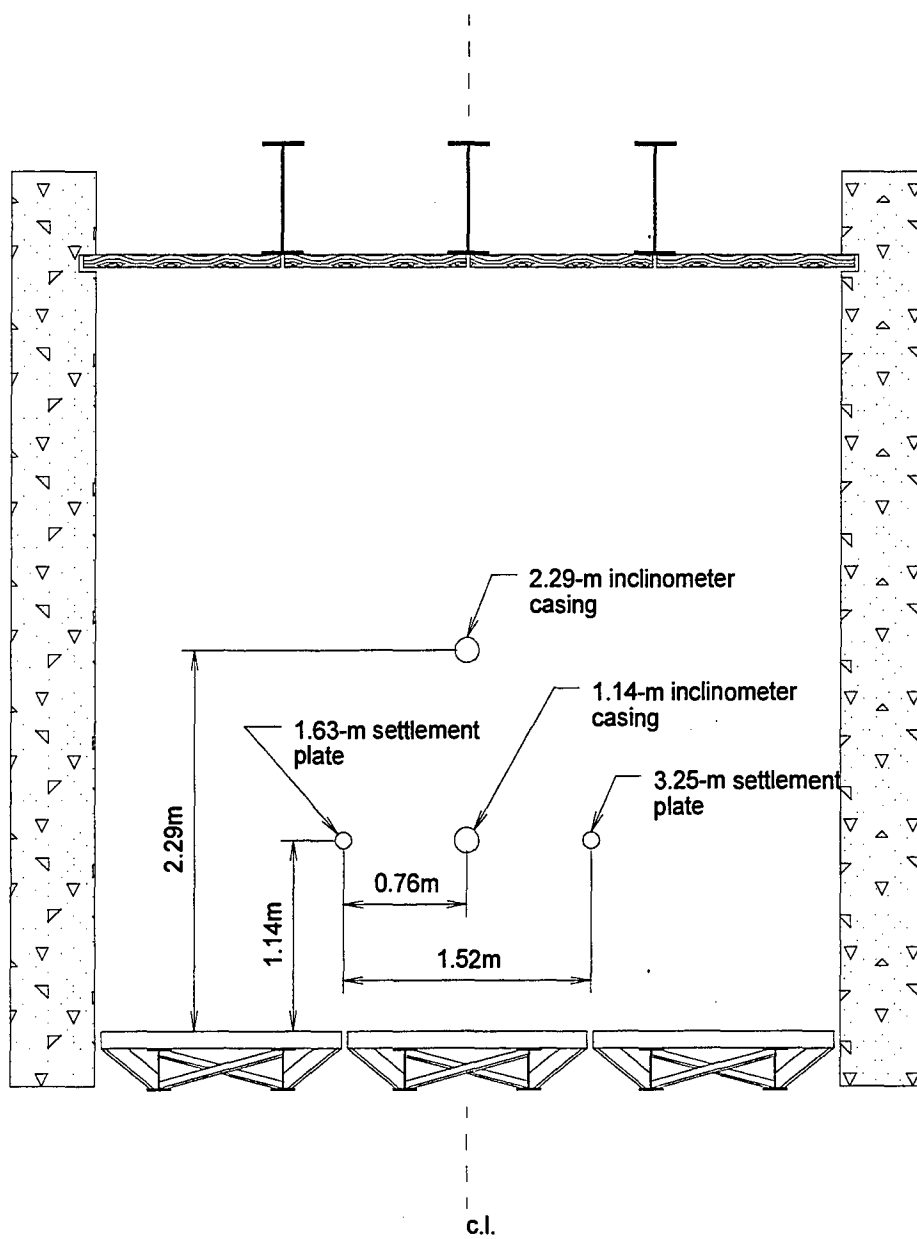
Plan view of facility showing location of settlement plates and inclinometer casings
